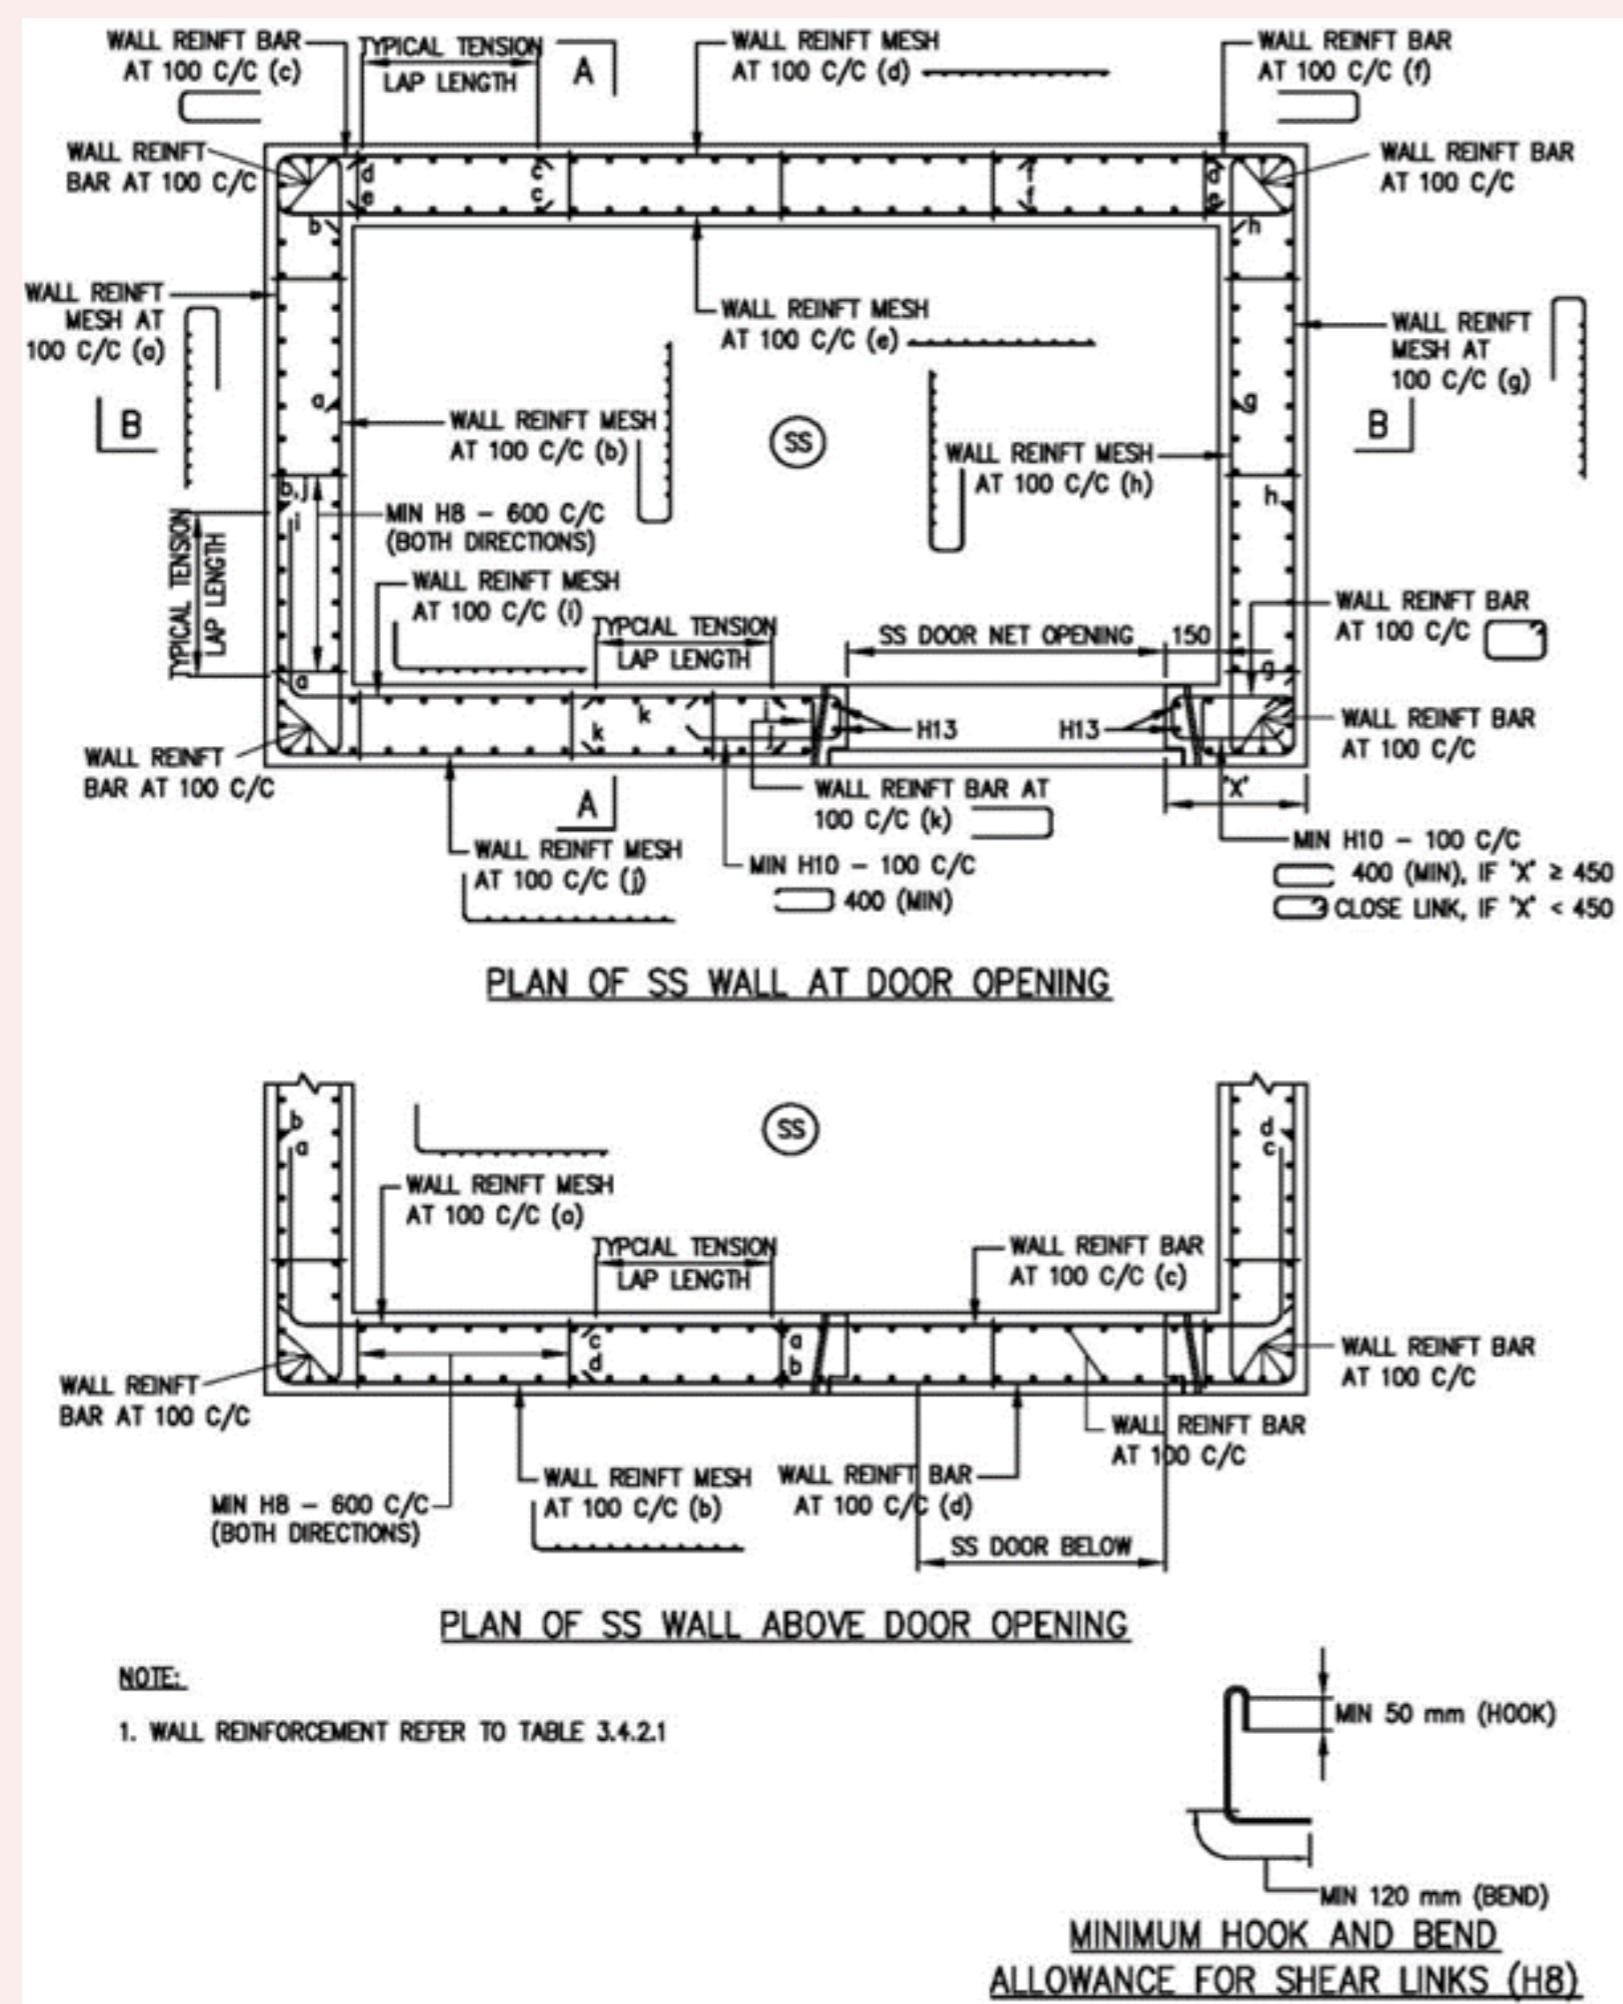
(b): SECTIONAL DETAILS OF SS SLABS/ WALLS
